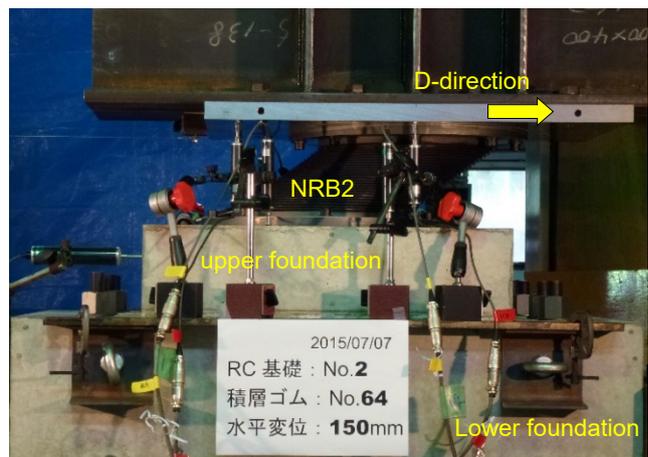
RC specimen No.2 (NRB deformed 150mm)
